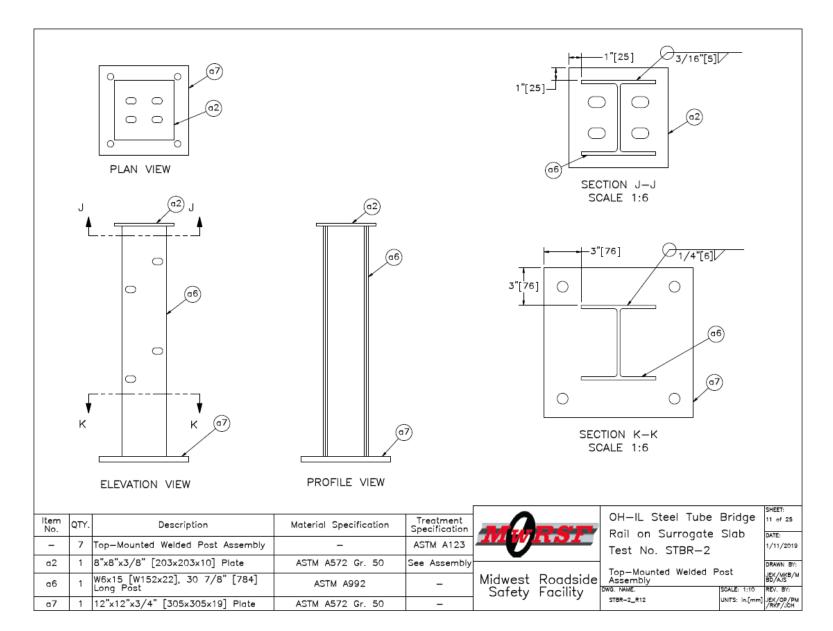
Top-Mounted Welded Post Assembly, Test No. STBR-2
